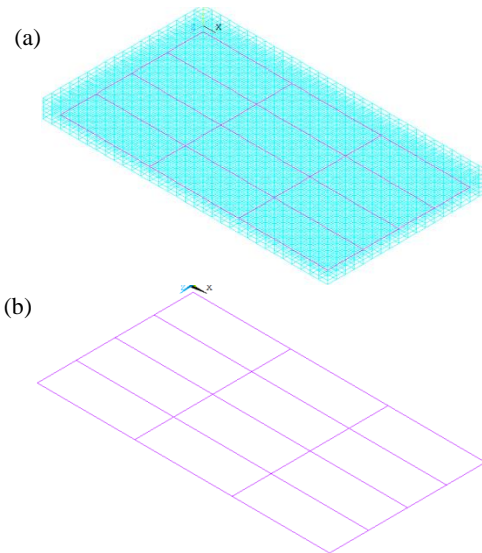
Modelling of reinforcing GFRP bars for slabs: a) GFRP bars positions; b) Link-180 element used for modelling bars.
